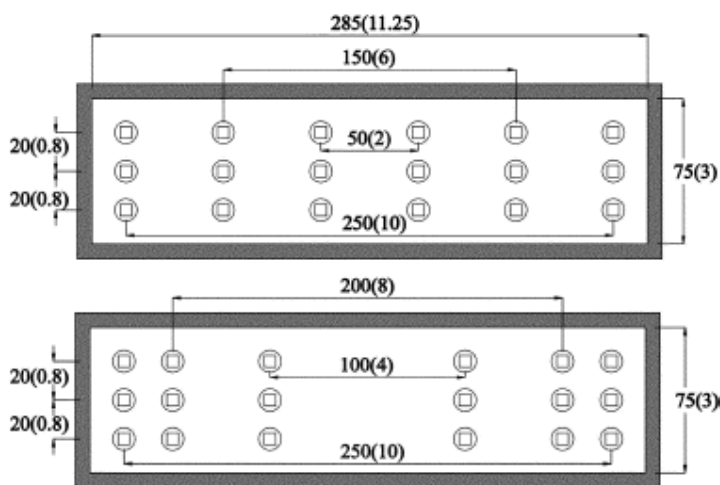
Arrangement of targets on top surface for gauge length experiment. (Note: dimensions in mm [in.].)
